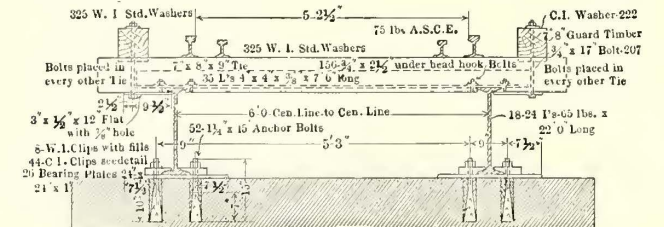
Boyertown & Pottstown Railway—Cross-Section of Lowland Bridge at Minister's Creek
